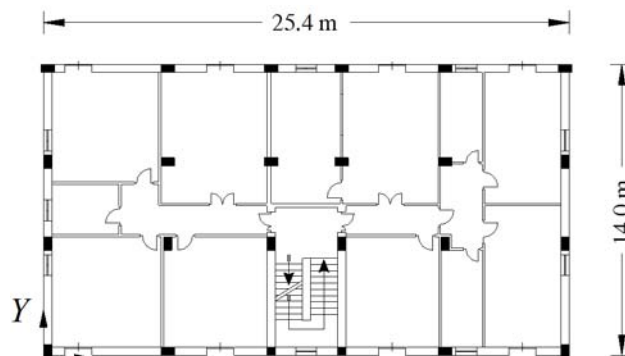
Standard floor plan for 'real' buildings (Cosenza *et al.* 2005)
